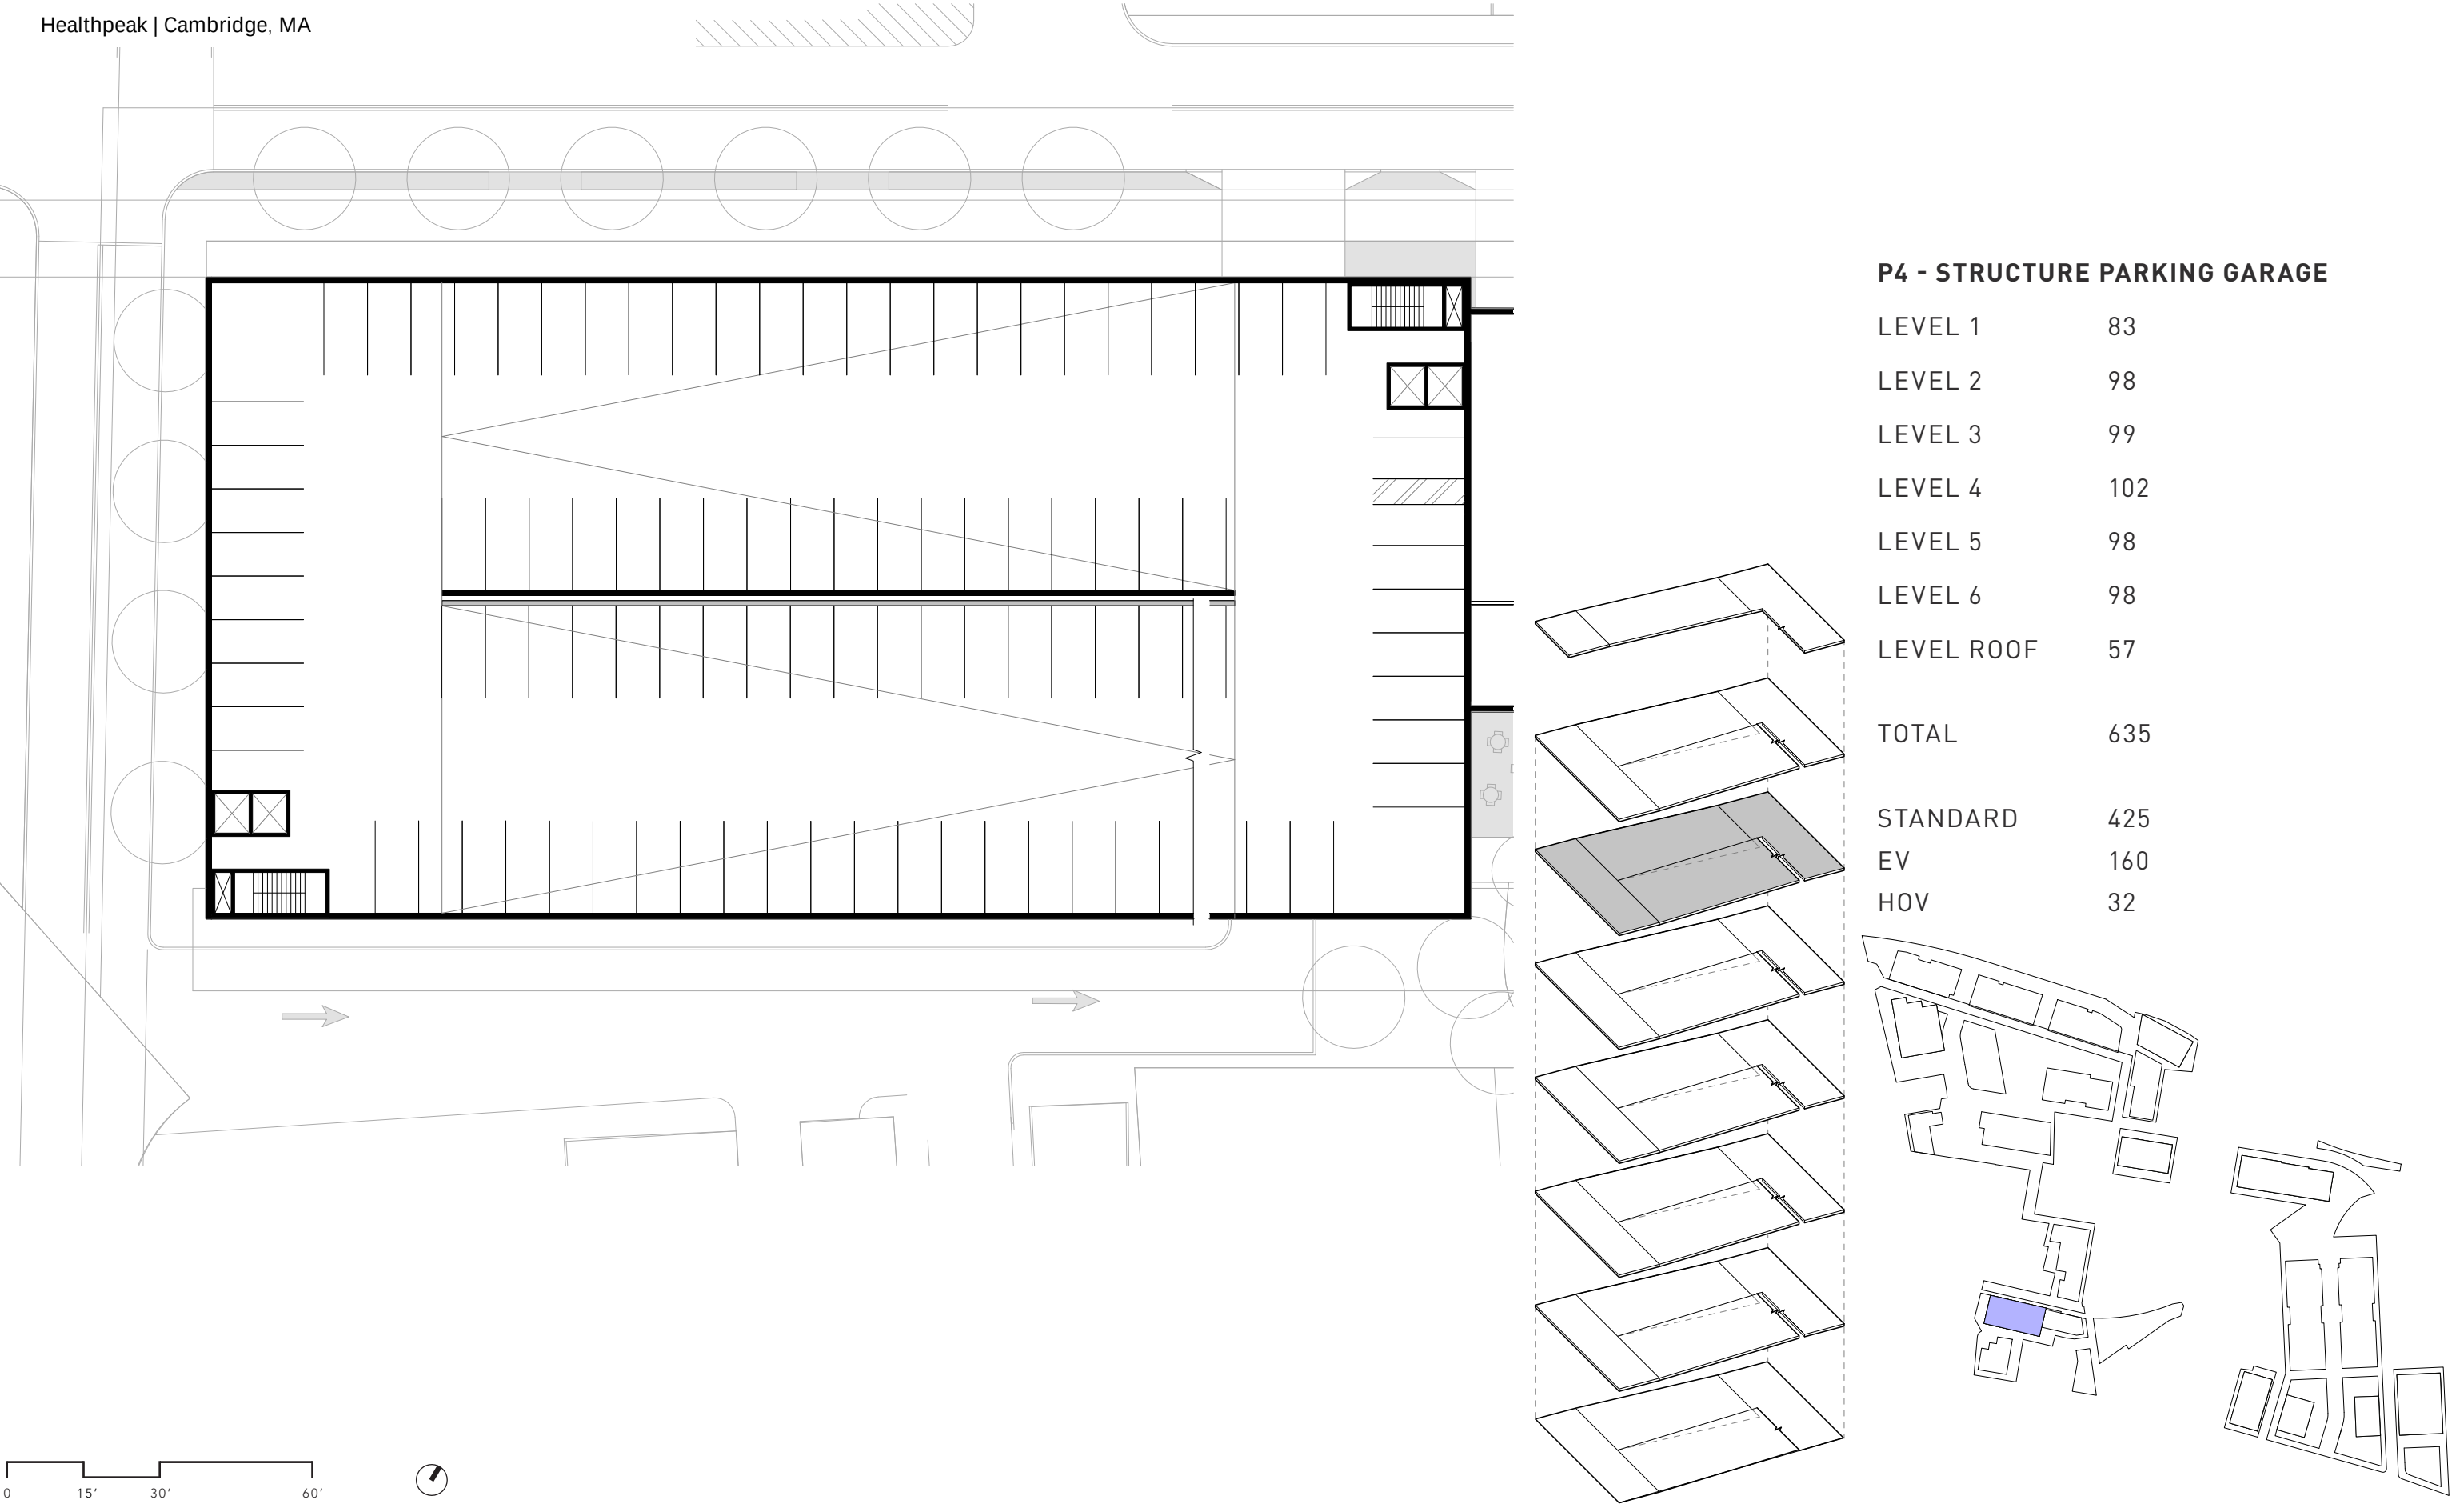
Proposed Vehicle Parking Plans - P4 Level Roof
